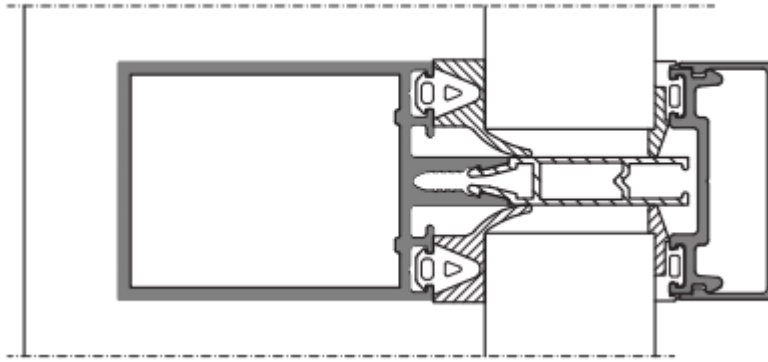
P50L dry glazing assembly. Figure adapted from [3].
